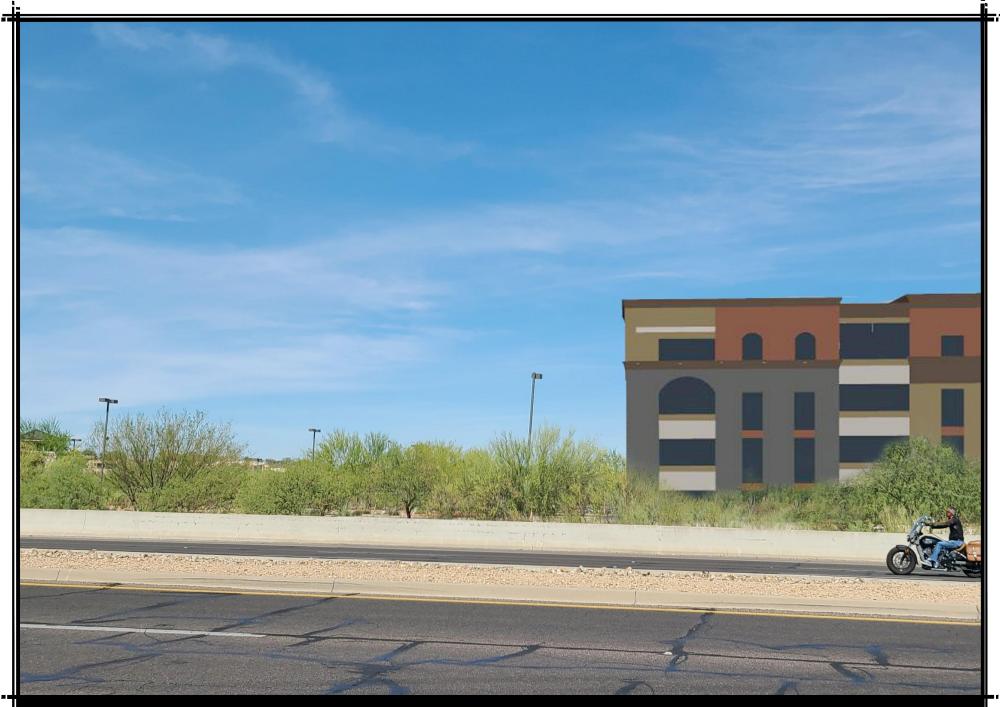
B: VIEWSHED PERSPECTIVE 13 - PROPOSED CONDITION
